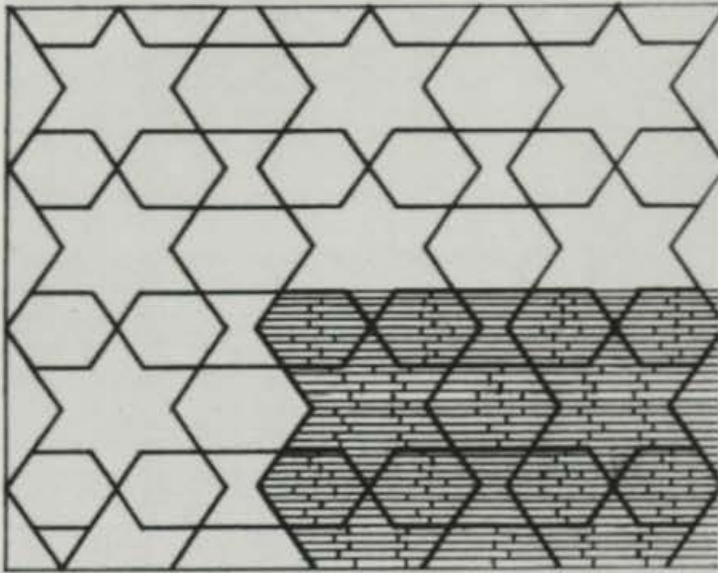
Wazir Khan Mosque, Lahore - cut and dressed flooring in geometrical pattern.
